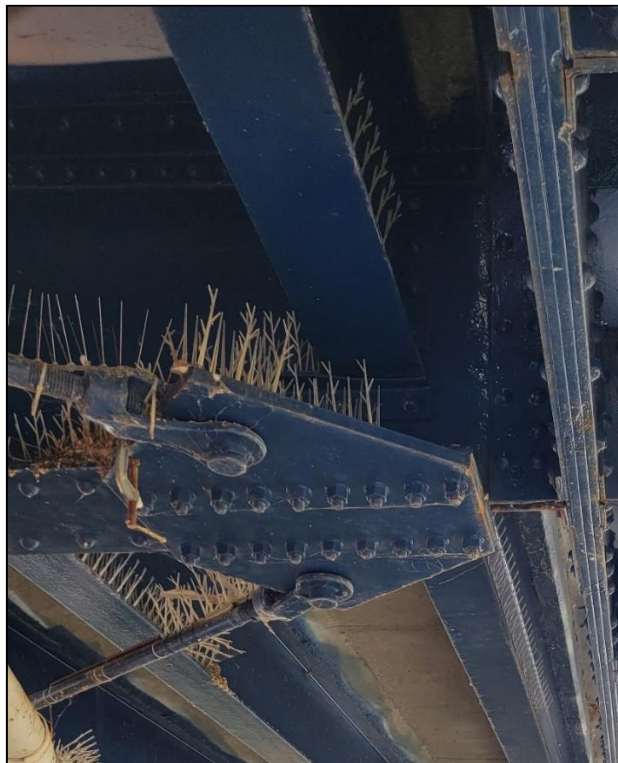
Looking south at Stringer 1 on the east side of Floorbeam 6.
